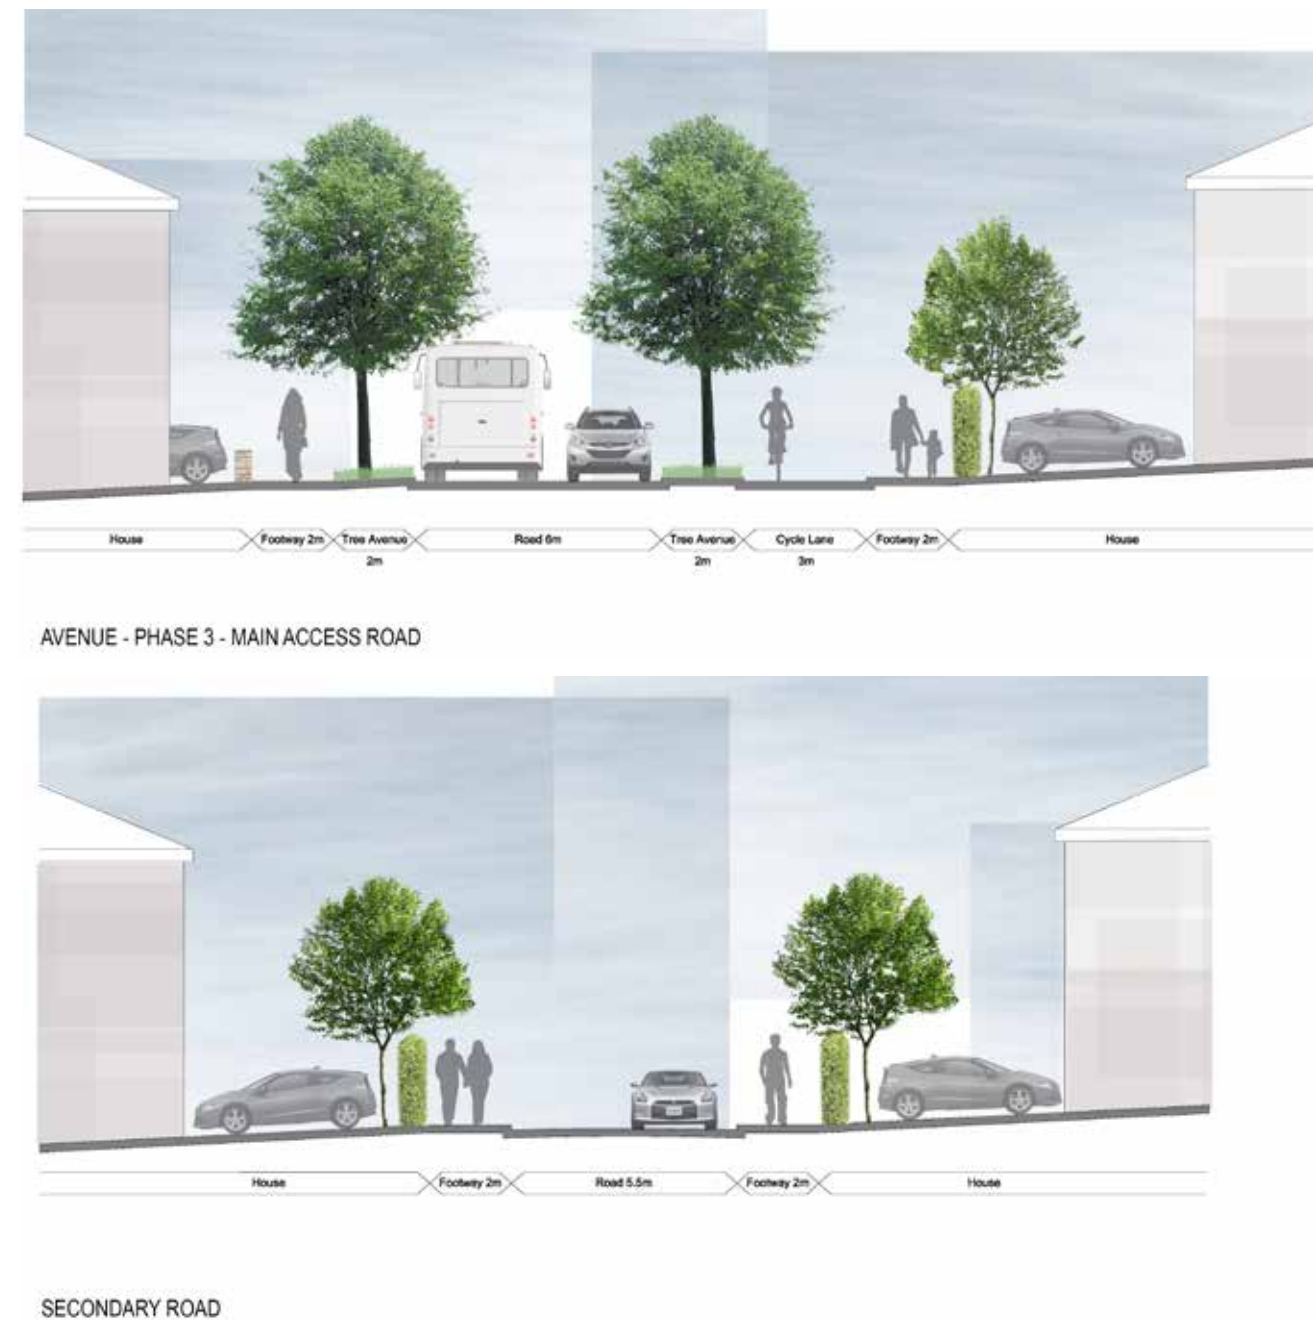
& 48: INDICATIVE STREET SECTIONS
